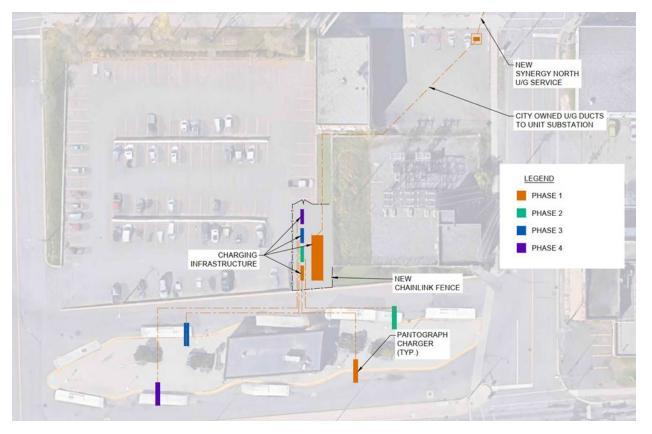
Conceptual Site Layout – Waterfront Transit Hub
